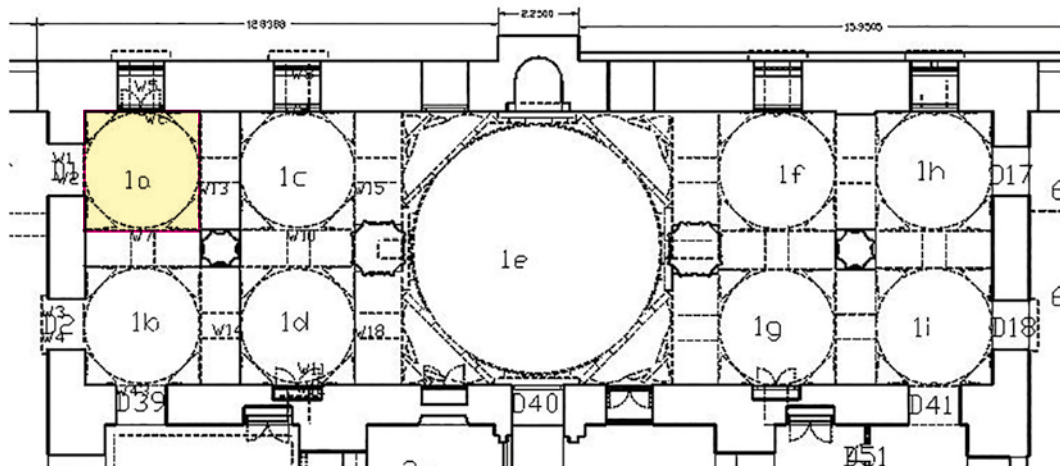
Floorplan of the Prayer Hall. In yellow, the west wing, small dome 1a, pilot-worksite.
